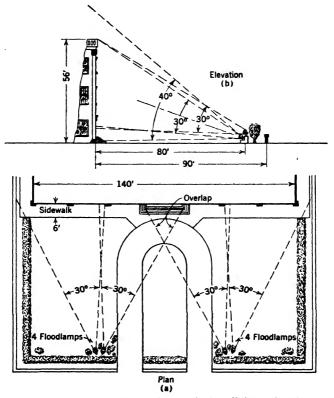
Plan and front elevation of a typical building, showing locations of proposed floodlamps and patterns of beam spread.
